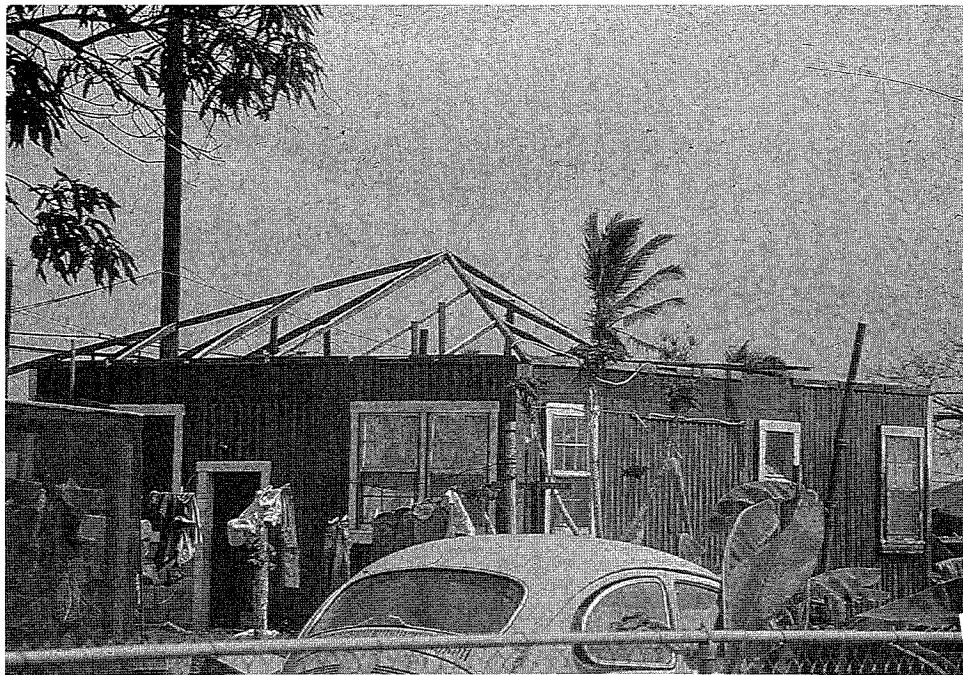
Light-frame wood roofs with corrugated metal roofing on single-wall homes did not fare well.
